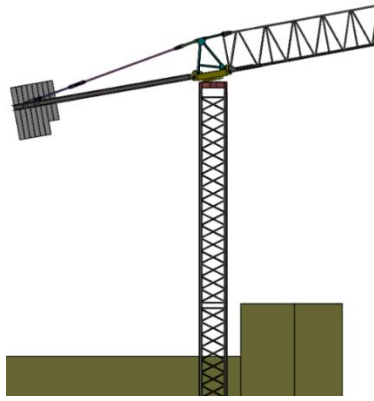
| Rotation of the horizontal section, due to the failure of swing unit bolts.
